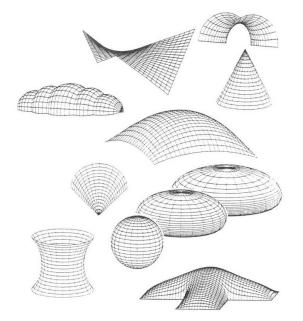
Suitable shapes of pneumatic formwork for concrete shells [6]
